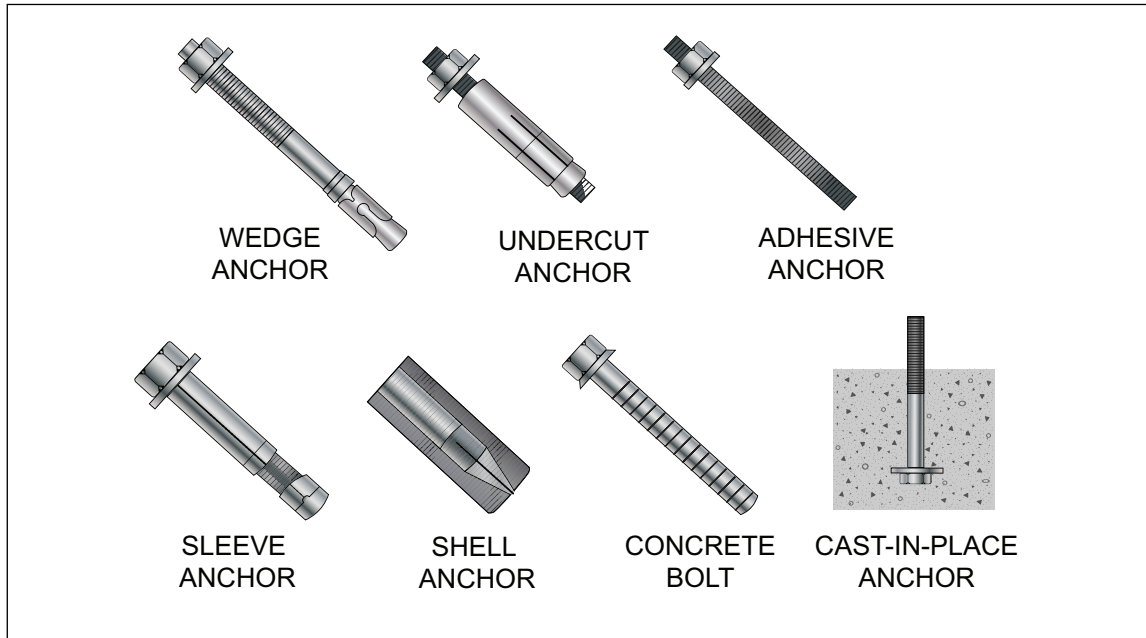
Different types of anchors for anchoring equipment to concrete structures (Figure 127 from FEMA 413)
